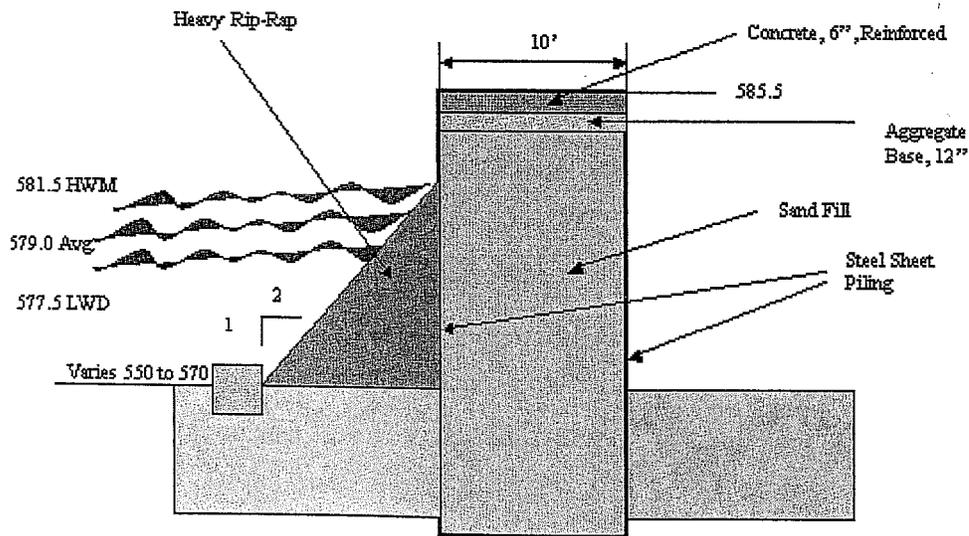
Typical Sheet-Pile Breakwater Cross-Section
